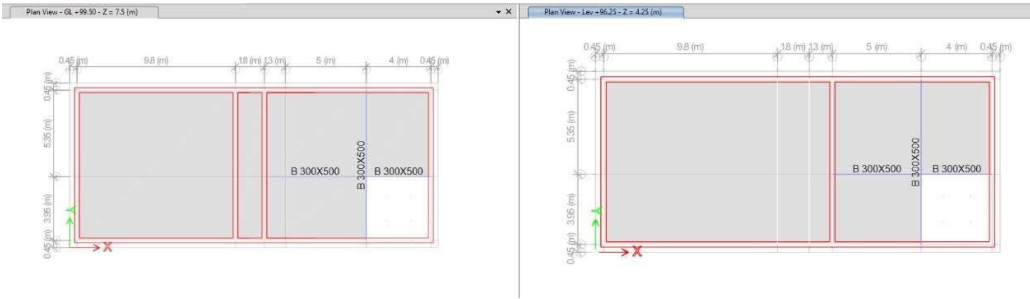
Beam Section Properties (Roof Slab & First Floor Slab)
